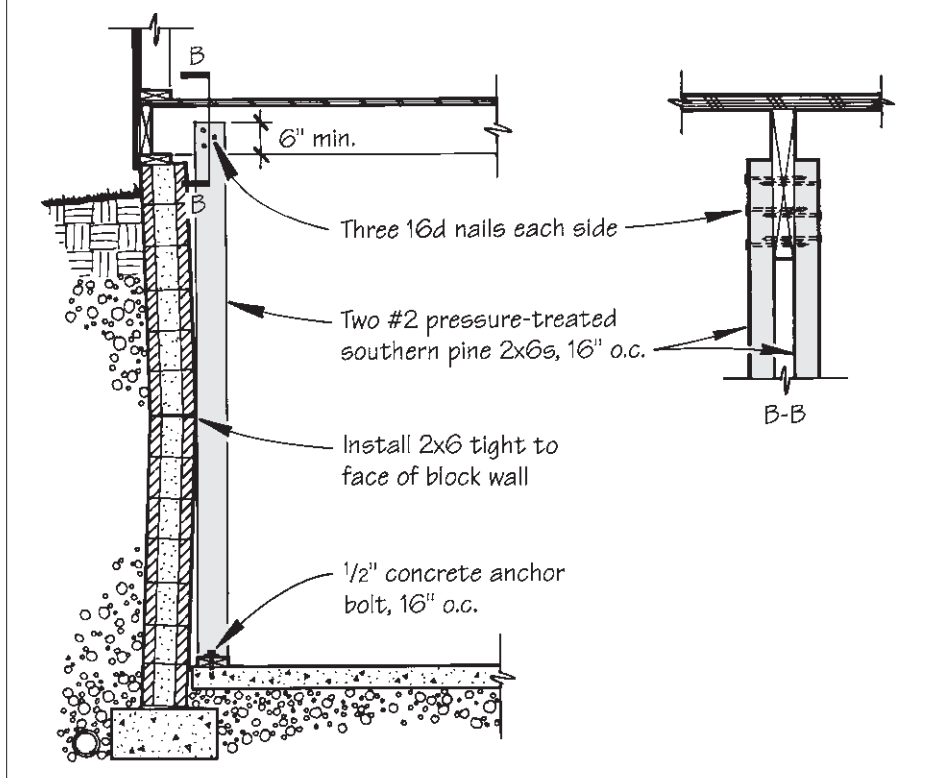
For less demanding conditions, the author sometimes specifies double 2x6 studs, 16 inches on-center, to brace a cracked block foundation. The top of the studs are nailed to the joists, while the bottom plate bolts to the slab or footings.
